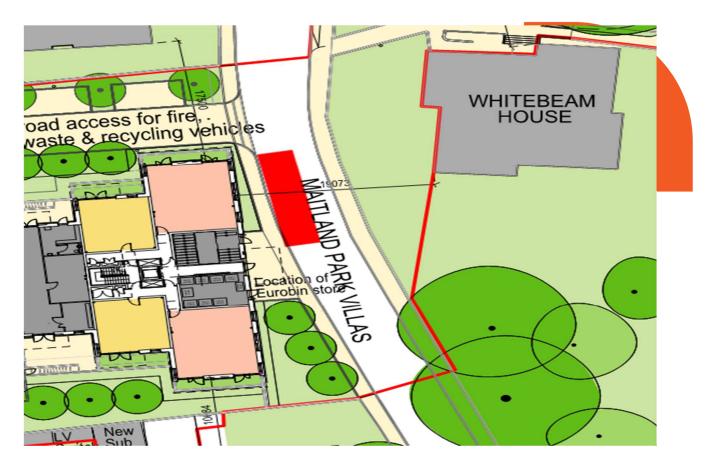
Parking suspensions along Aspen House site from w/c 22/02/2021 are shaded in red
